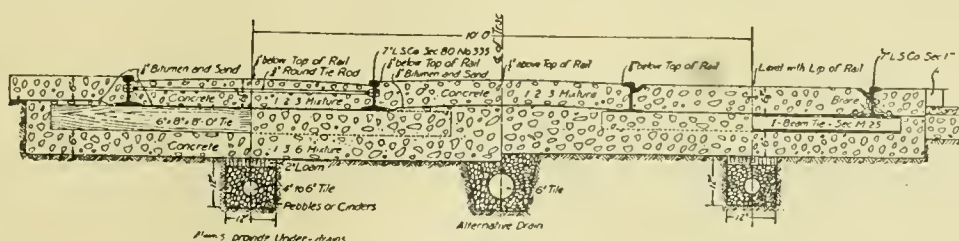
Alternative designs for concrete pavement between street railway tracks.
